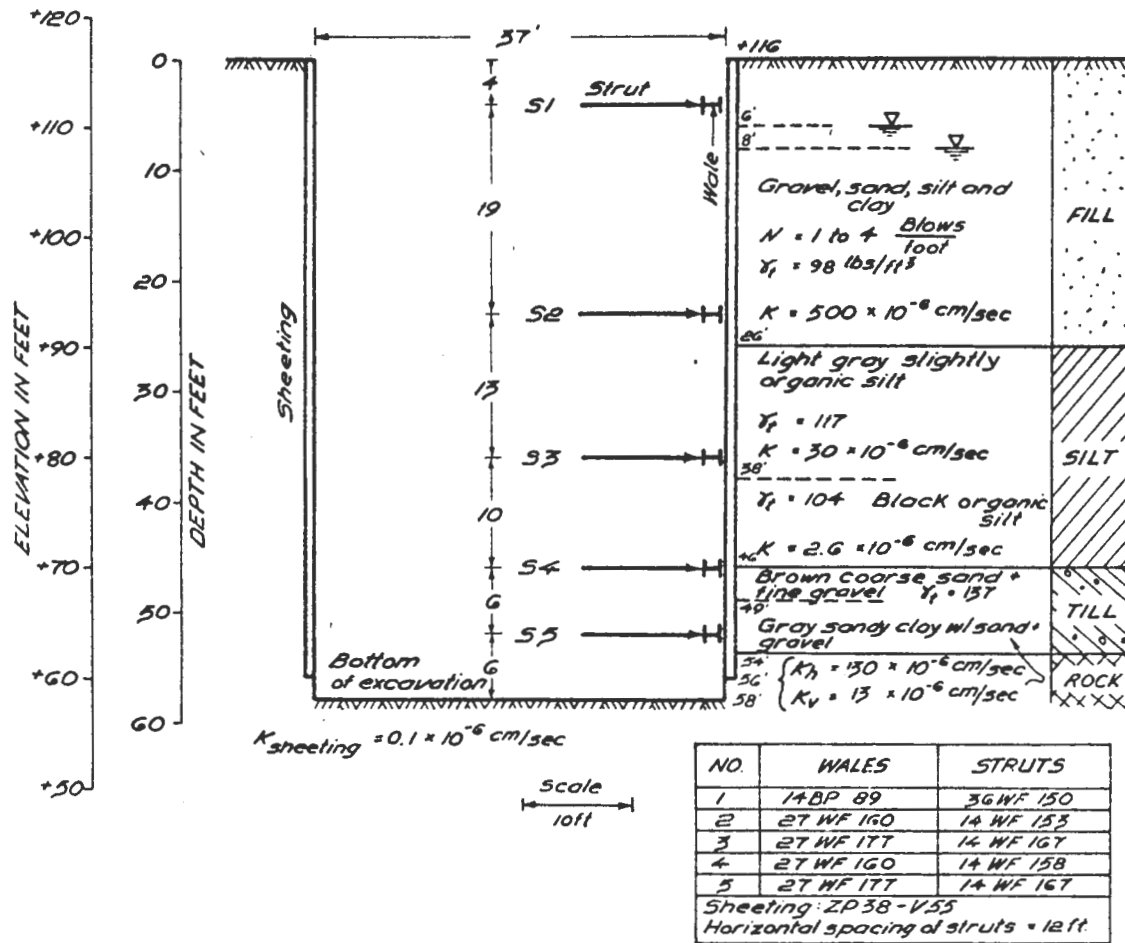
CROSS SECTION AT TEST SECTION B
